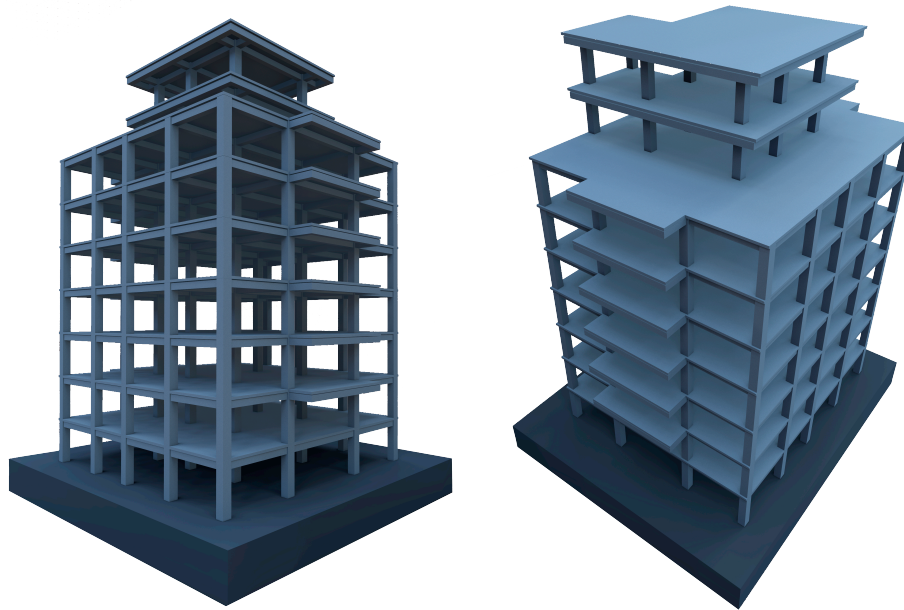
10-storey building with reinforced concrete frames and a stiff plate foundation.
